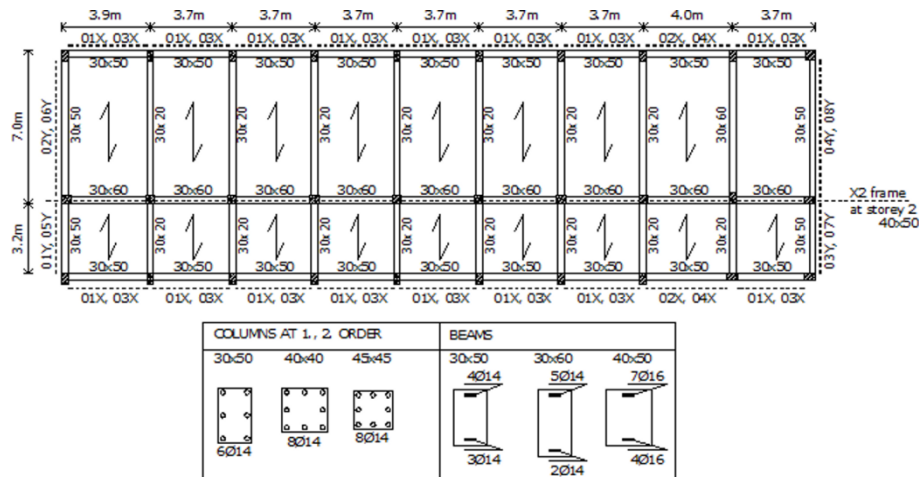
The case study: structural plan of the ground floor and scheme of the longitudinal reinforcement in the main structural elements.
